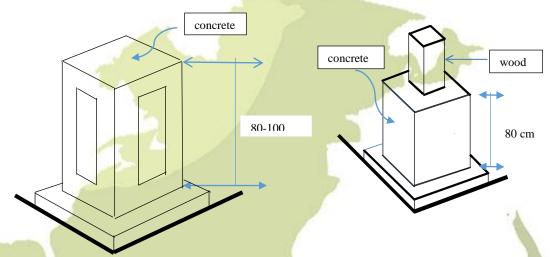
Types of foundation suitable for Houses Construction in Rawa Tripa
